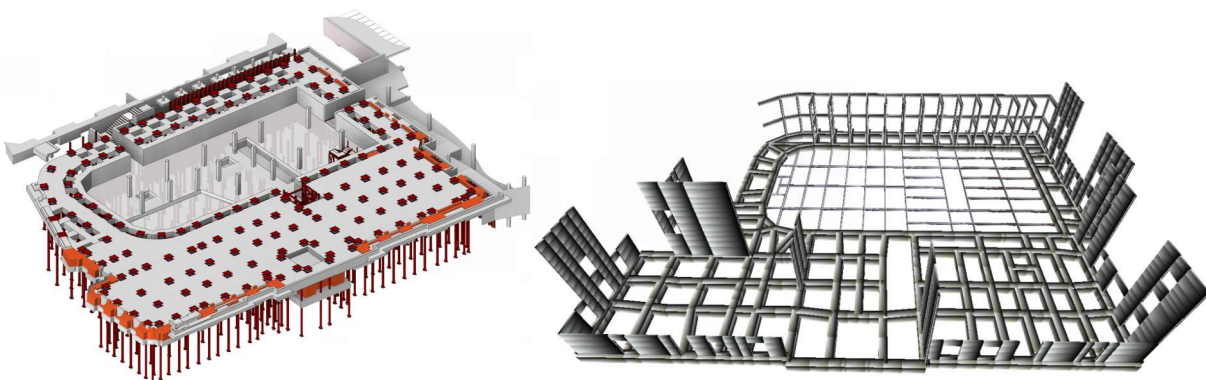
Distribution of isolators (left) and new reinforced concrete superstructure elements (right)
